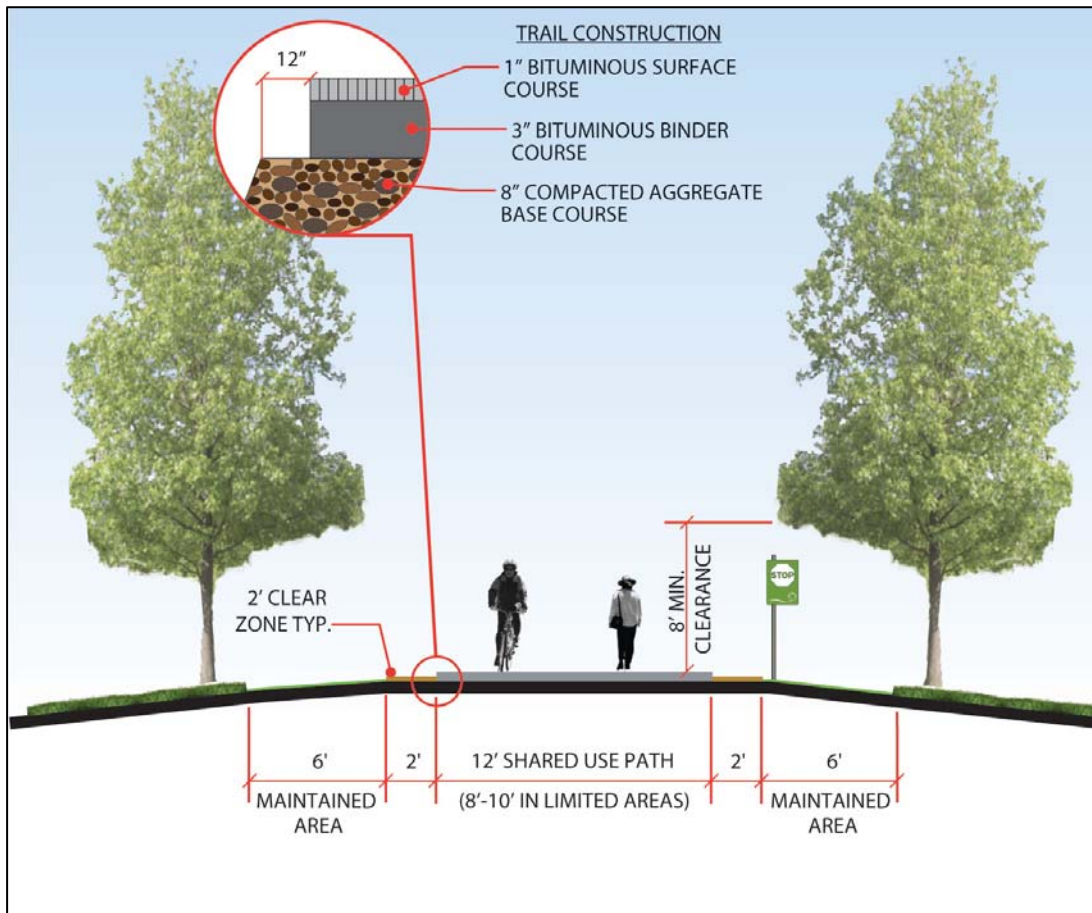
Louisville Loop (Multi-Use Trail) Typical Section
